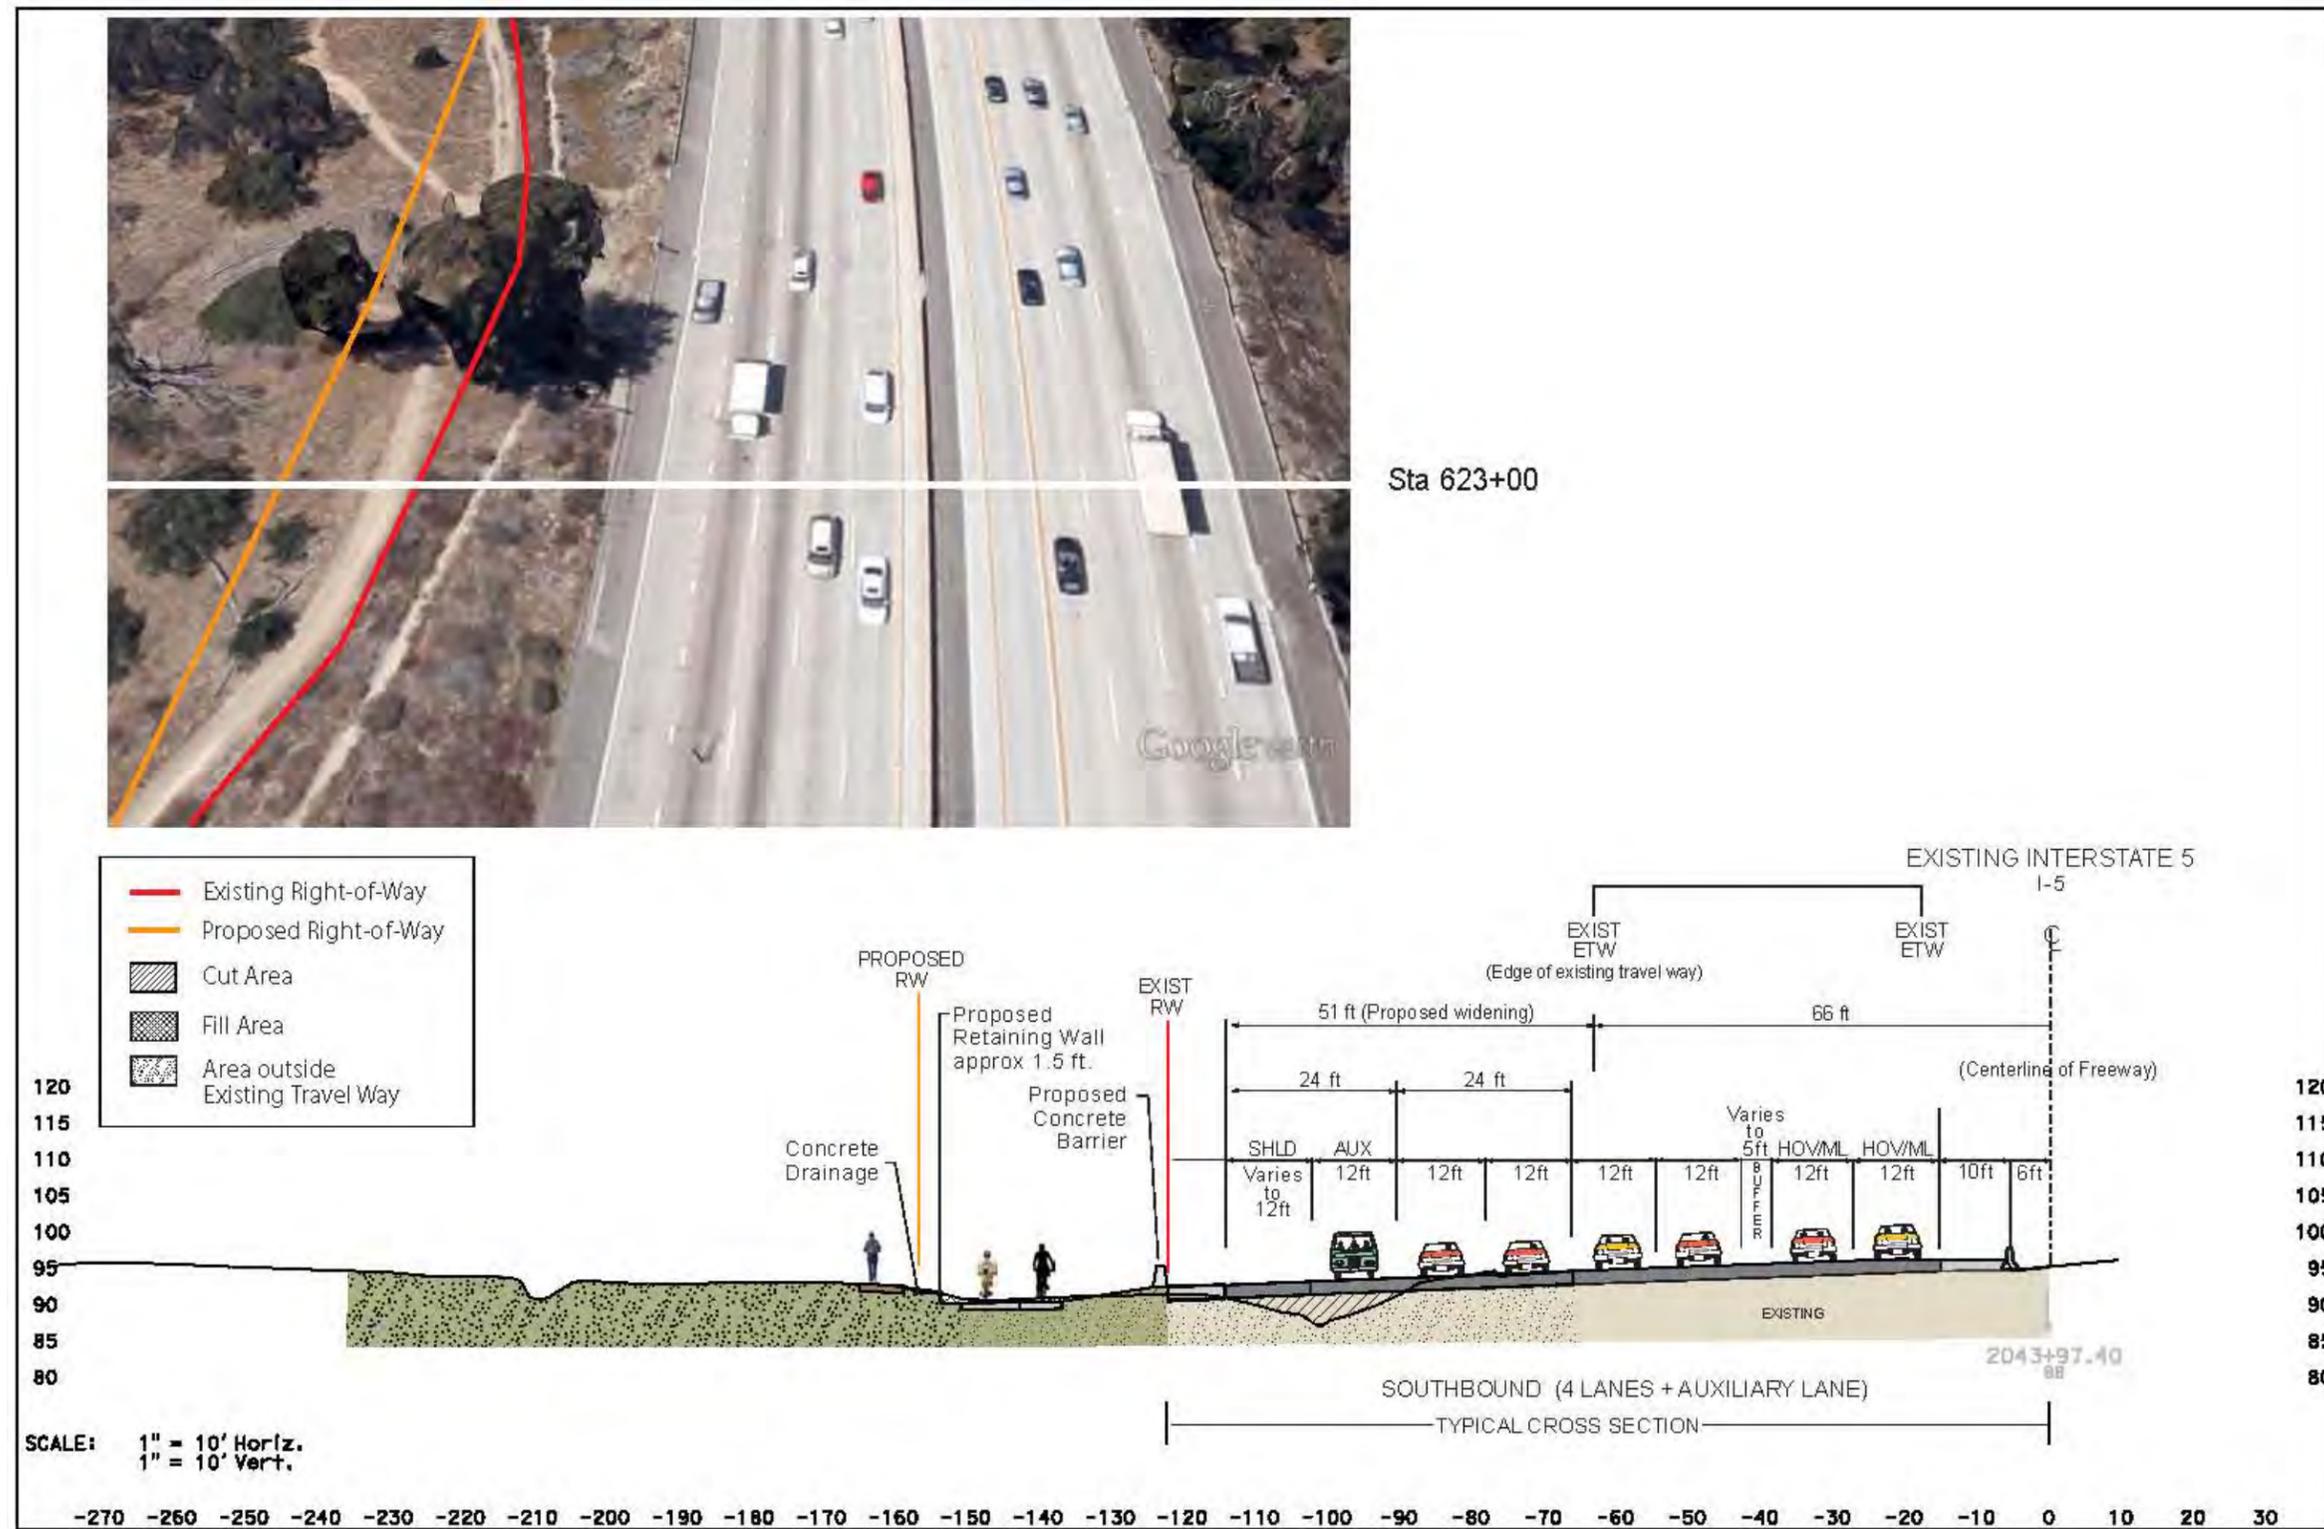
Preferred Alternative Cross Section at Sta. 623 + 00
